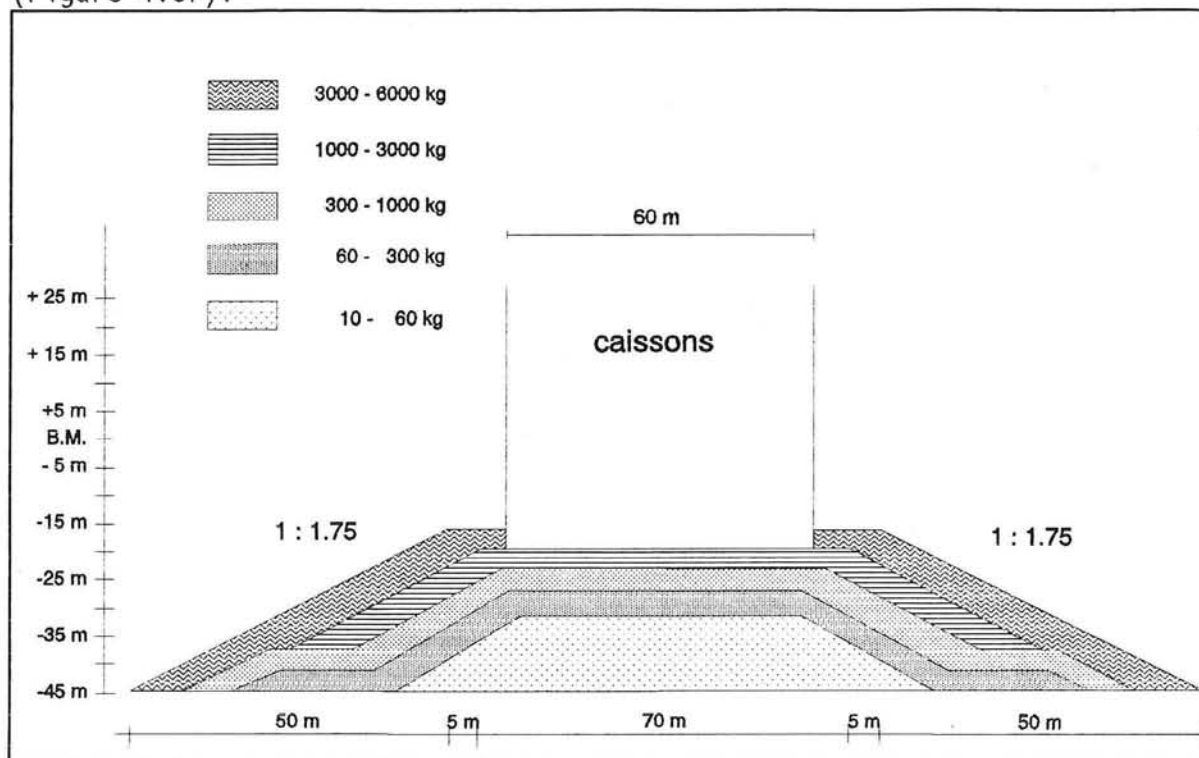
Foundation sill and armour layer after placement of the caisson
